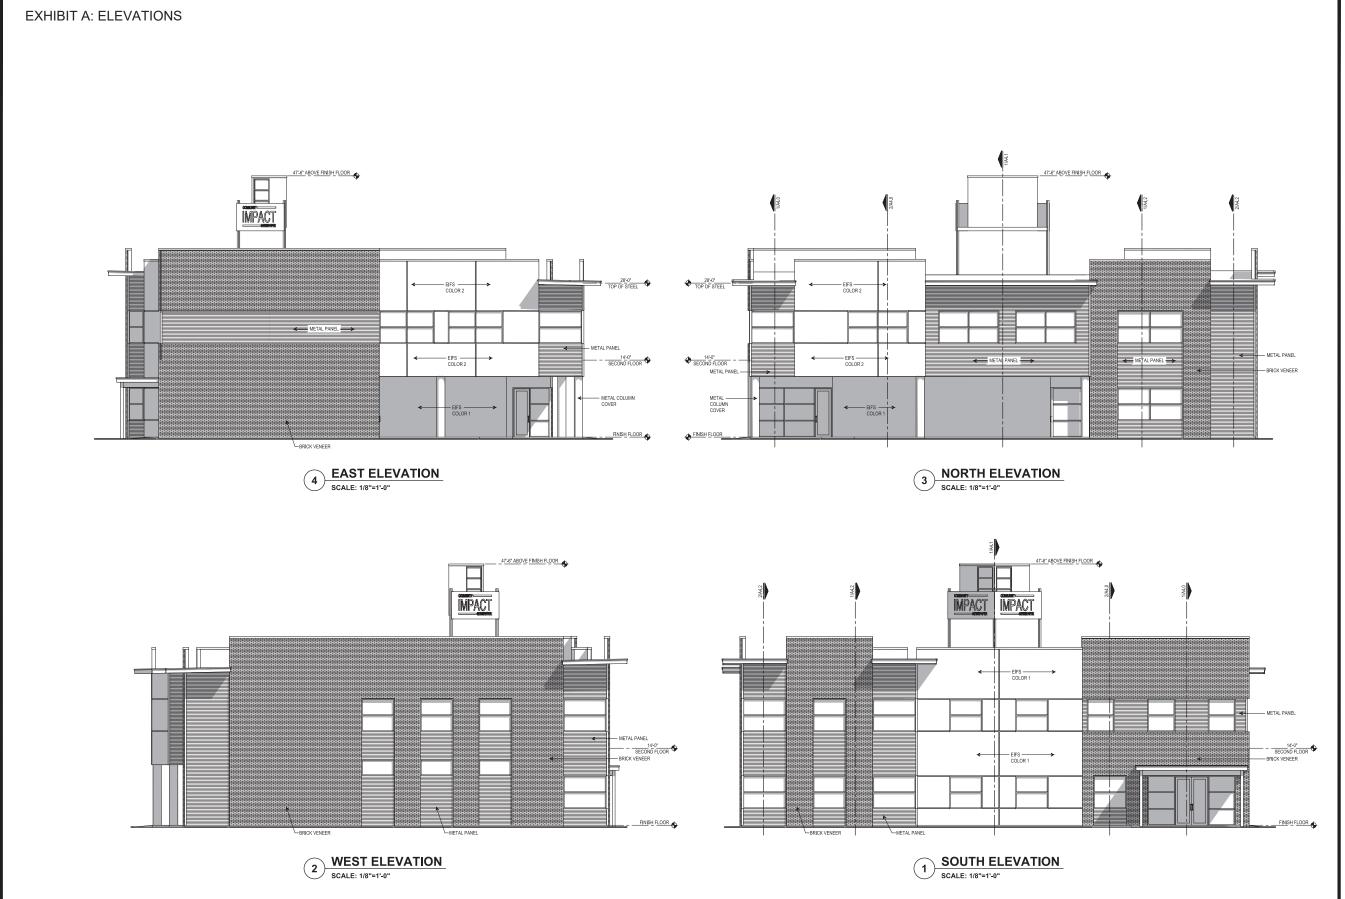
Exhibit A Planning and Zoning Alternative Comprehensive Signage Plan
